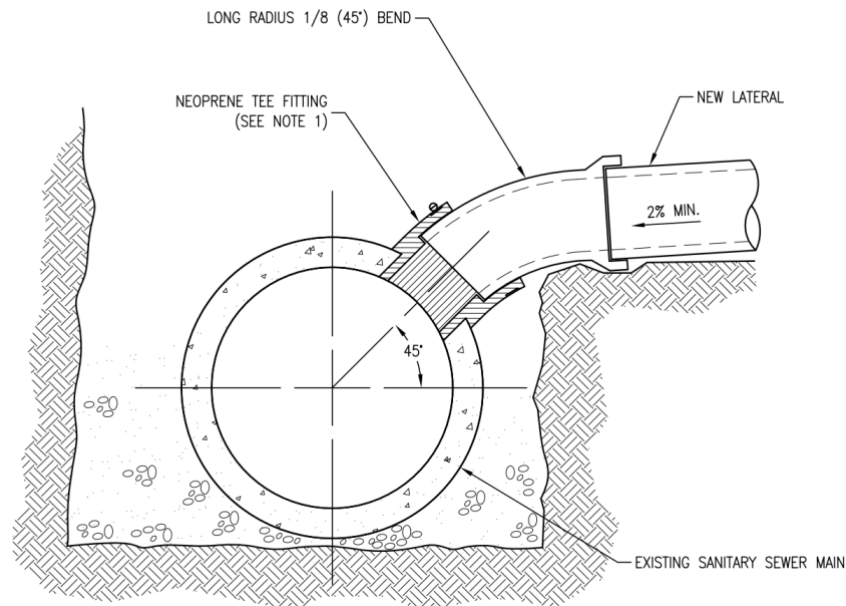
Example detail of how the sanitary sewer lateral on the project site should connect to the existing sanitary sewer main on Campbell Avenue. Sourced from (Tran, 2013).
